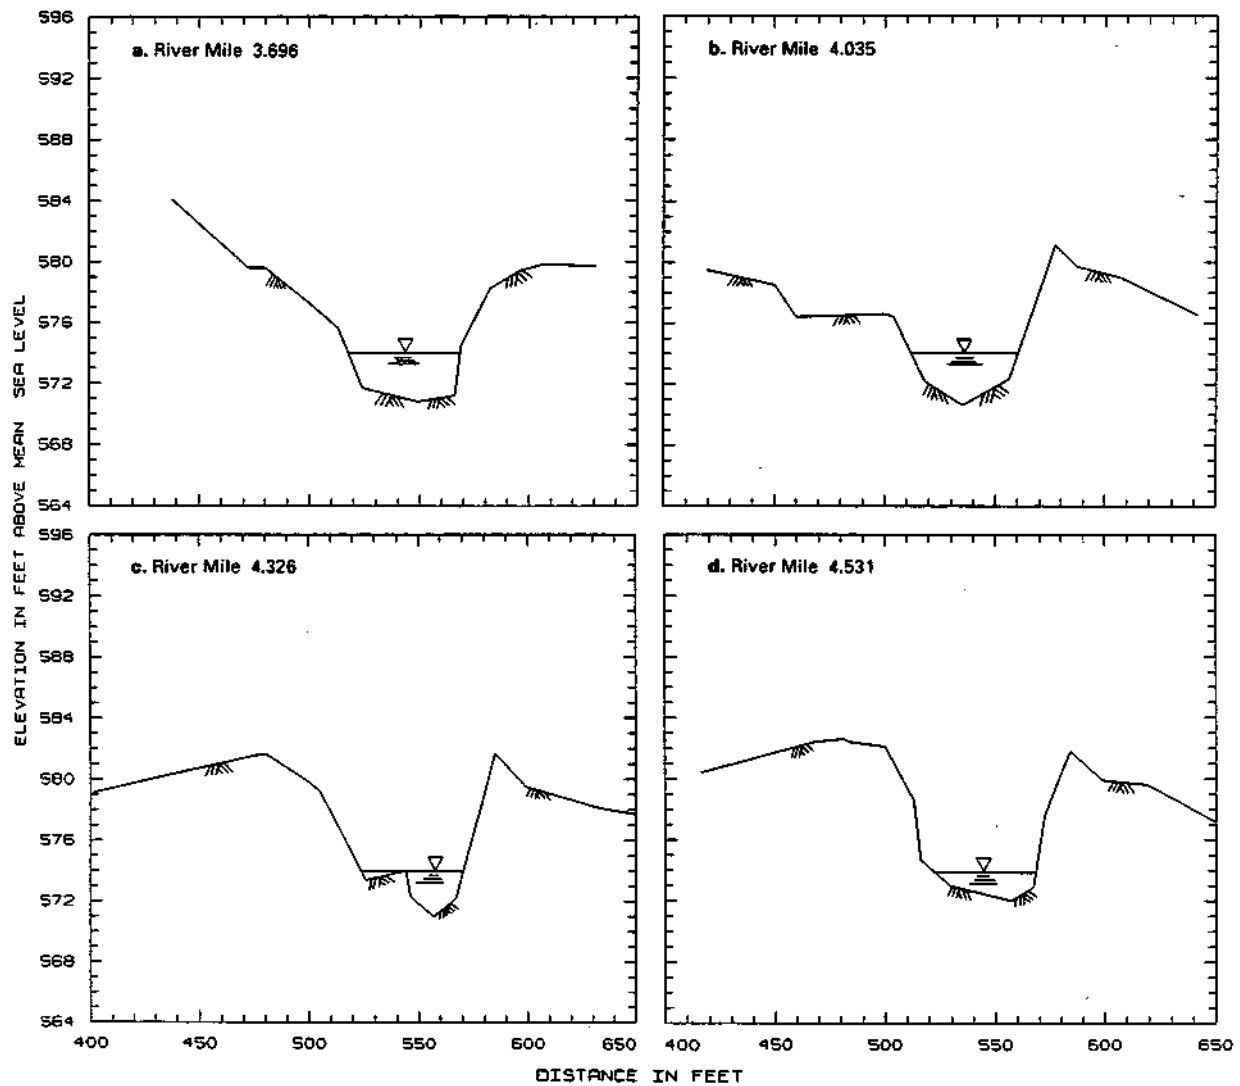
Proposed water elevations at selected cross sections between Lock 1 and the Texaco dam
